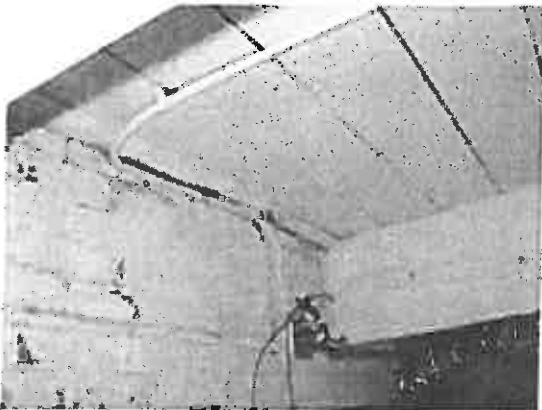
View of gray painted wood trim board, roof deck, and supports - LBP.
